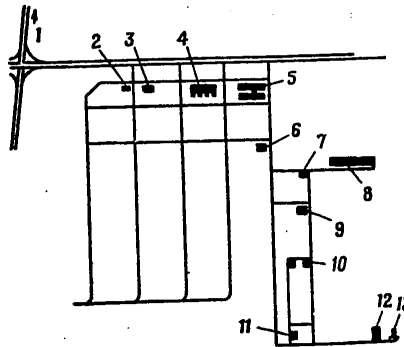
Industrial area (arrangement of the basic buildings and structures):
